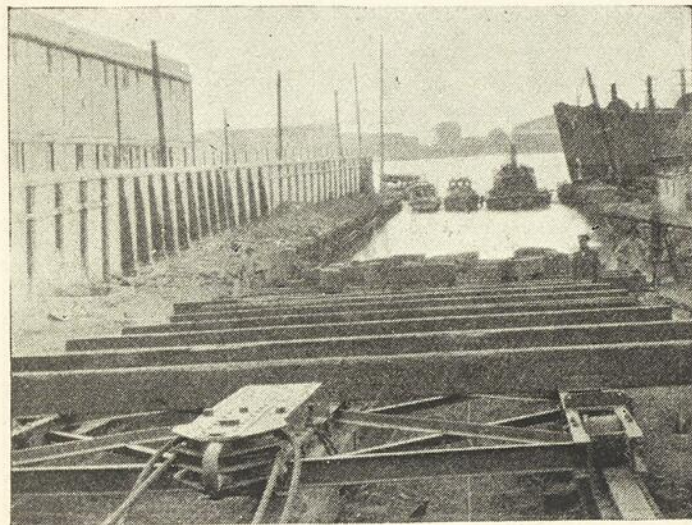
Shipway to take 1000 ton steamers new Engineering & Shipbuilding Co. Ltd.
